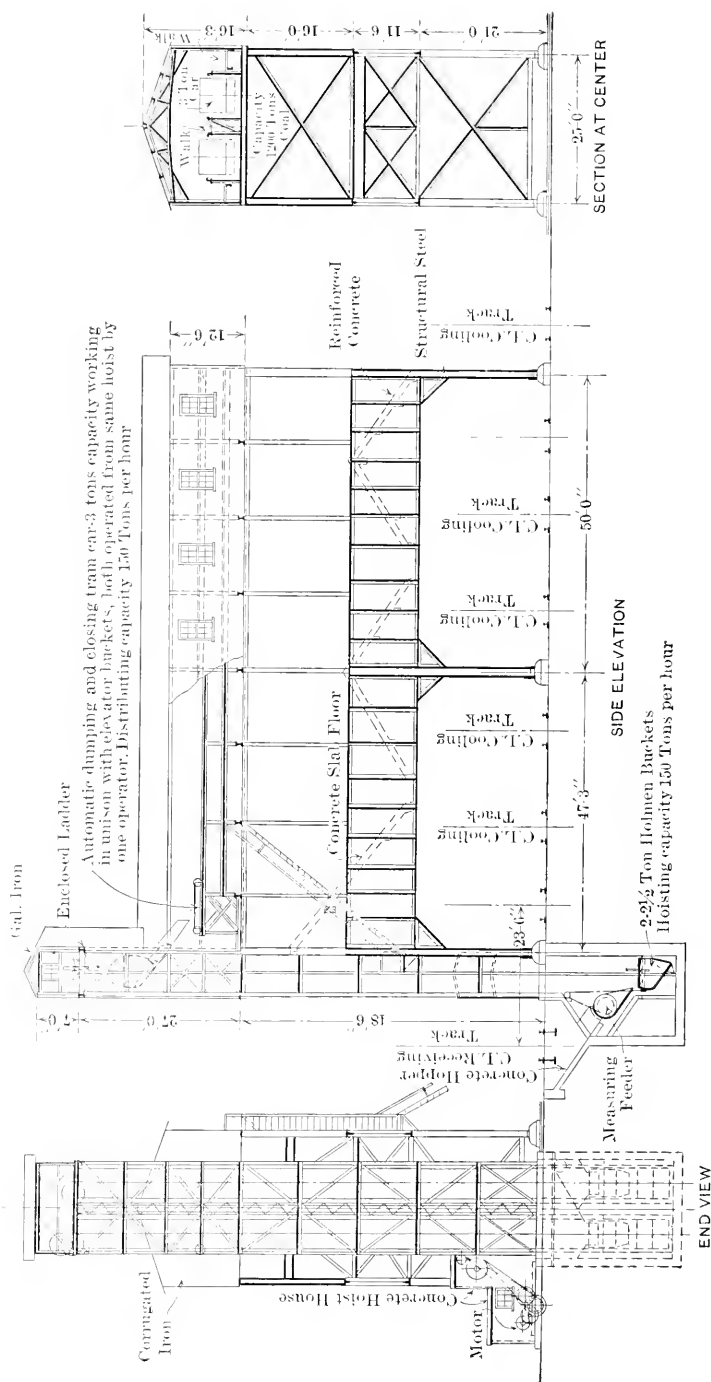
COALING STATION WITH BUCKET ELEVATOR
